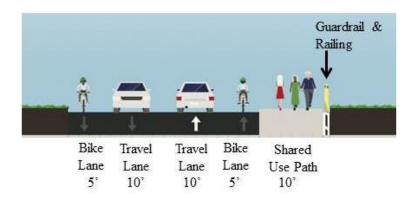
Protective rail on the backside of a guardrail adjacent to the sidewalk.
